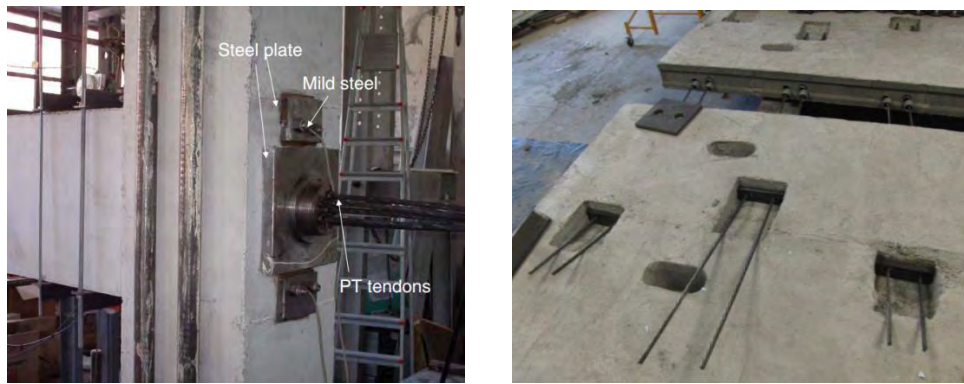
Beam-to-Column and Transverse Bridge Deck Post-Tensioned Connections (Ozden and Ertas, 2007; Wells, 2012)
